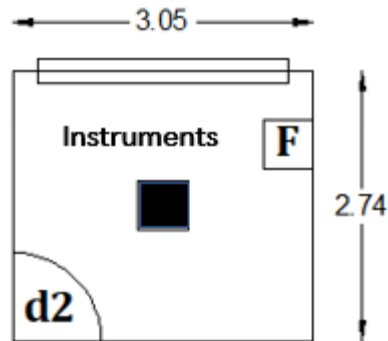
Plan view of the test chamber used for the experiment on wall paint (All the dimensions are in meters)
